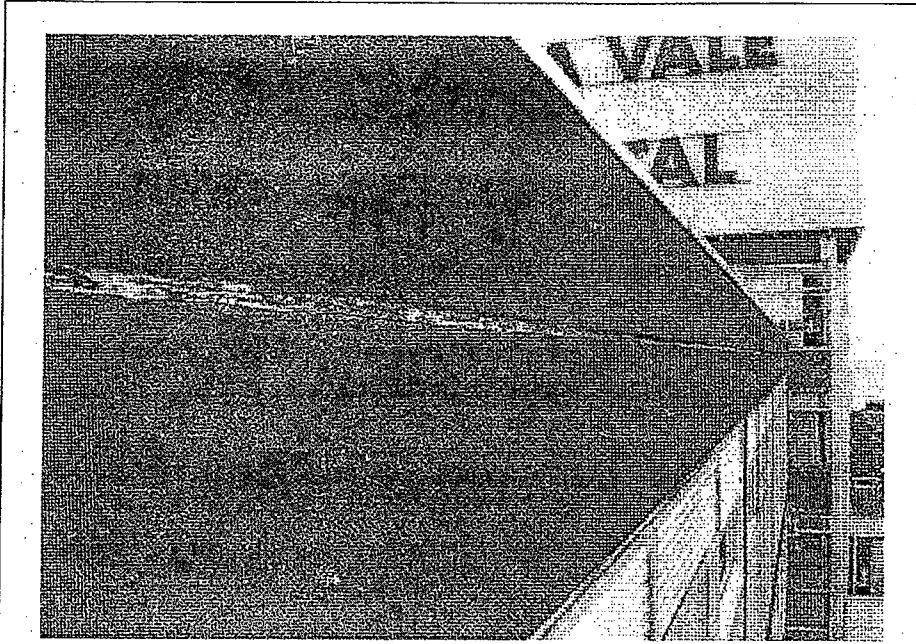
Rendered Beams & Columns – Pinned rendered beams on the western wing.
